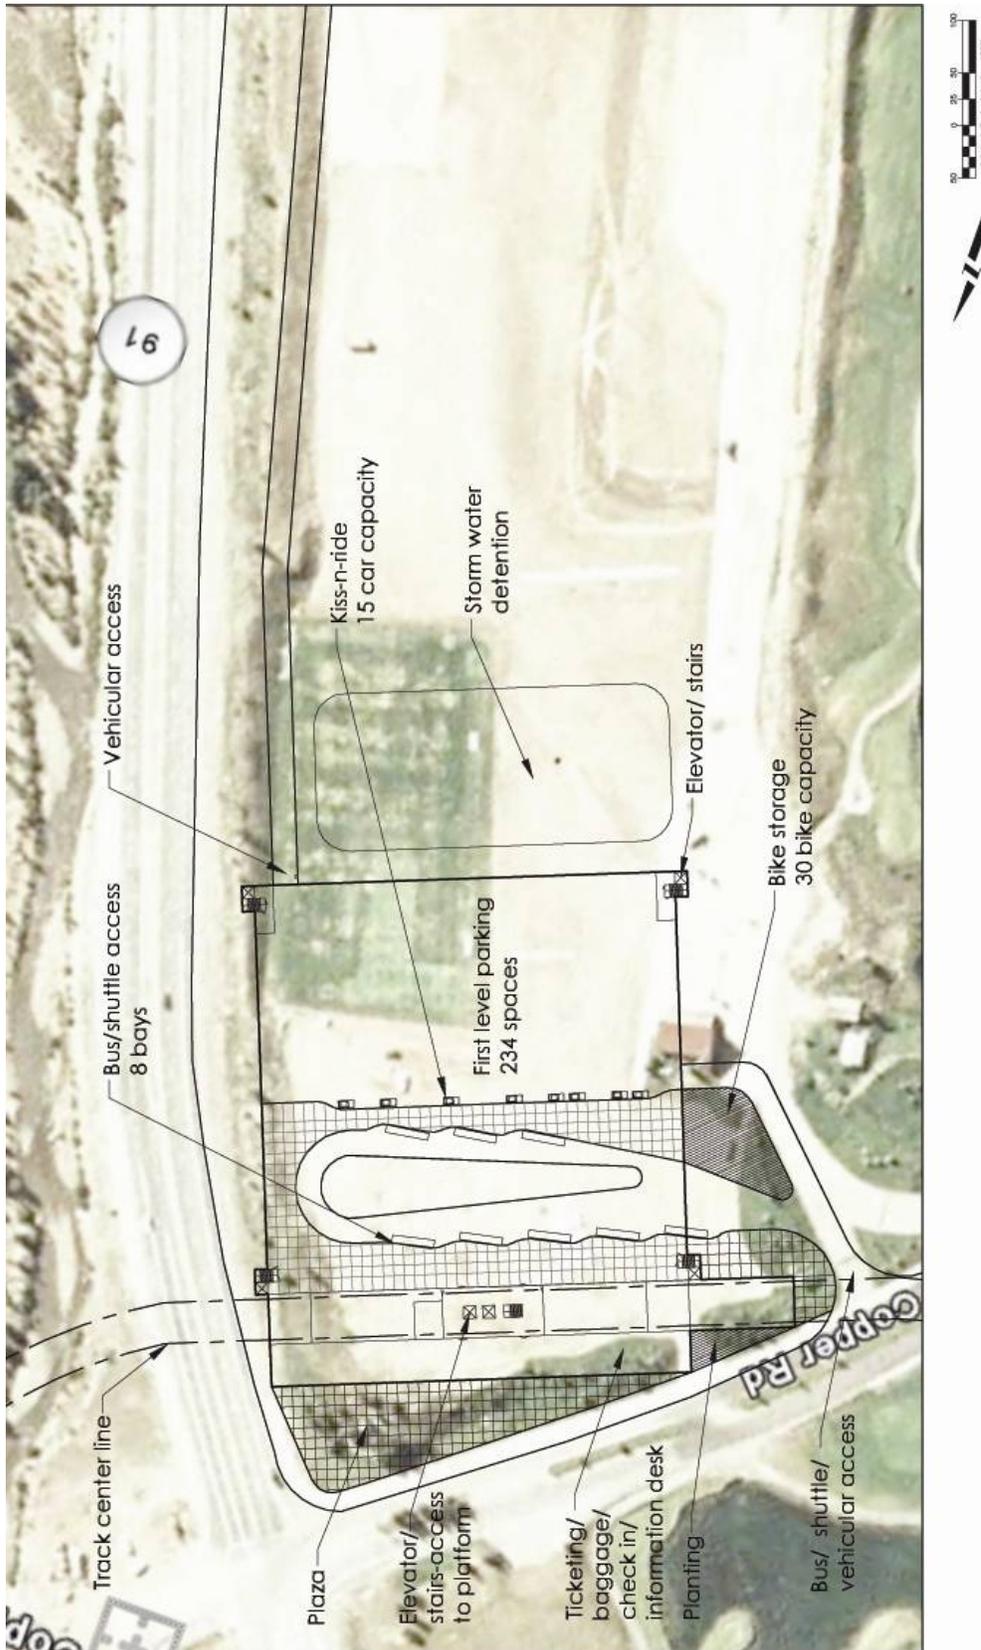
Plan View of the First Floor of an Example Tier 1 Regional Station at Copper Mountain Ski Area
